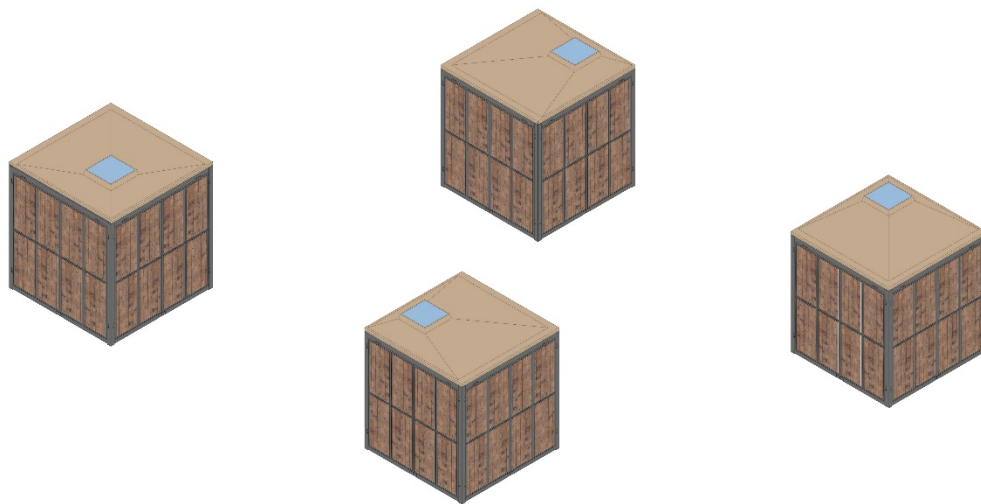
Multiple modules, separated, closed, with wooden panels on door component
